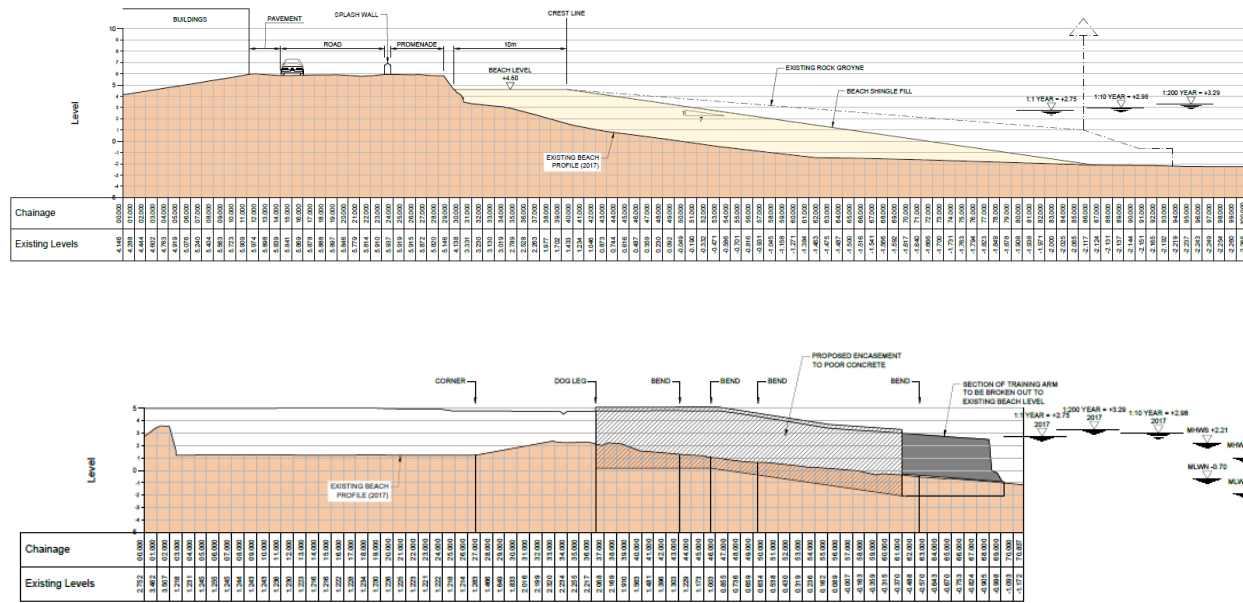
Proposed SBM Scheme Shore-Based Works
